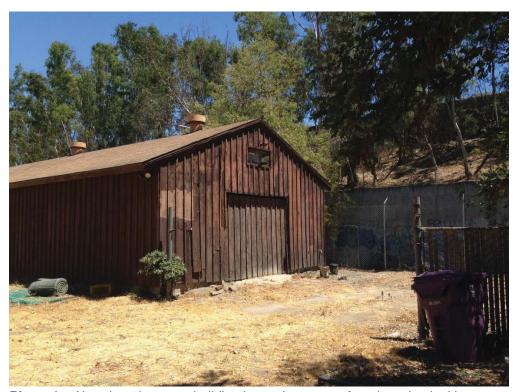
Abandoned storage building in southern part of project site, looking southeast, with UP Railroad berm and tracks in background
